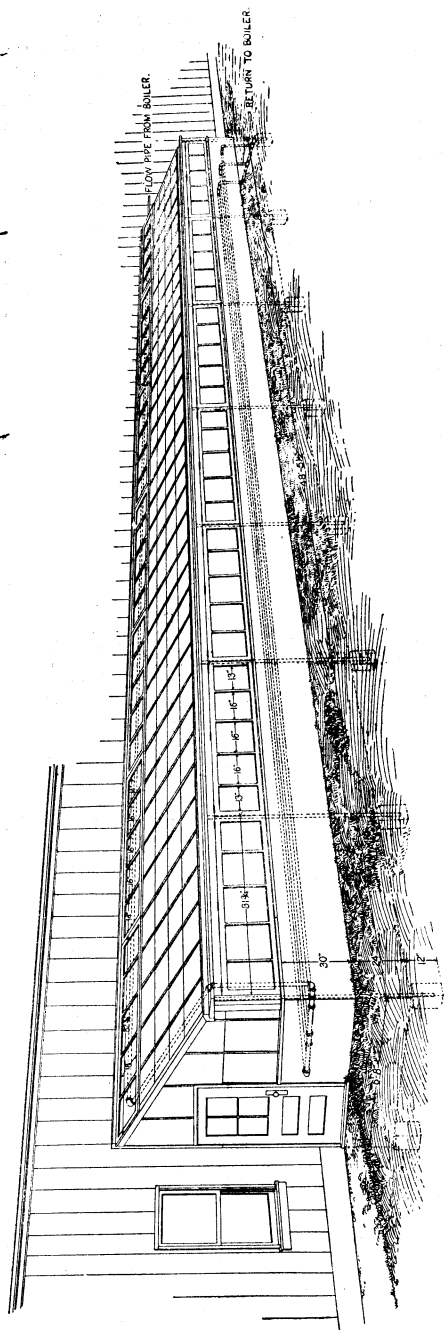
A lean-to greenhouse built against a building. This house is 6 feet 8 inches wide and may be made any reasonable length.
